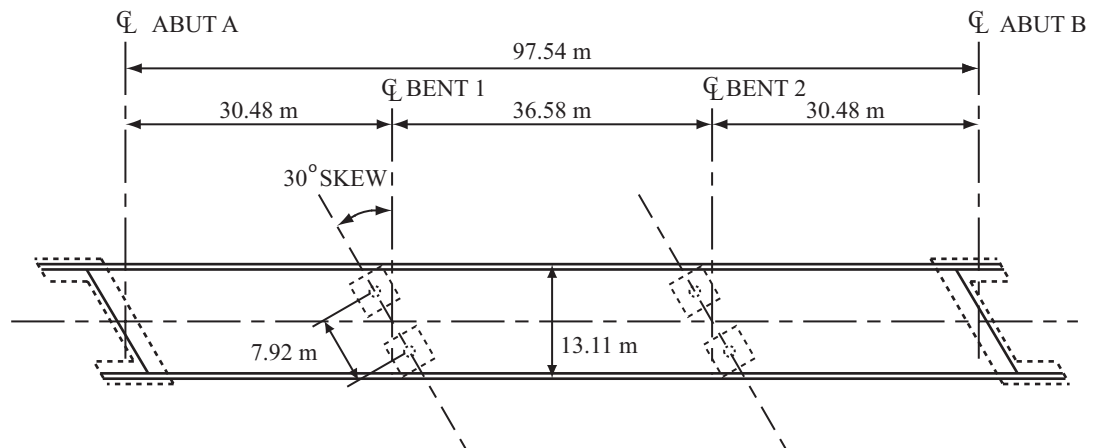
The plan view of the FHWA No. 4 bridge (Courtesy of the FHWA).
